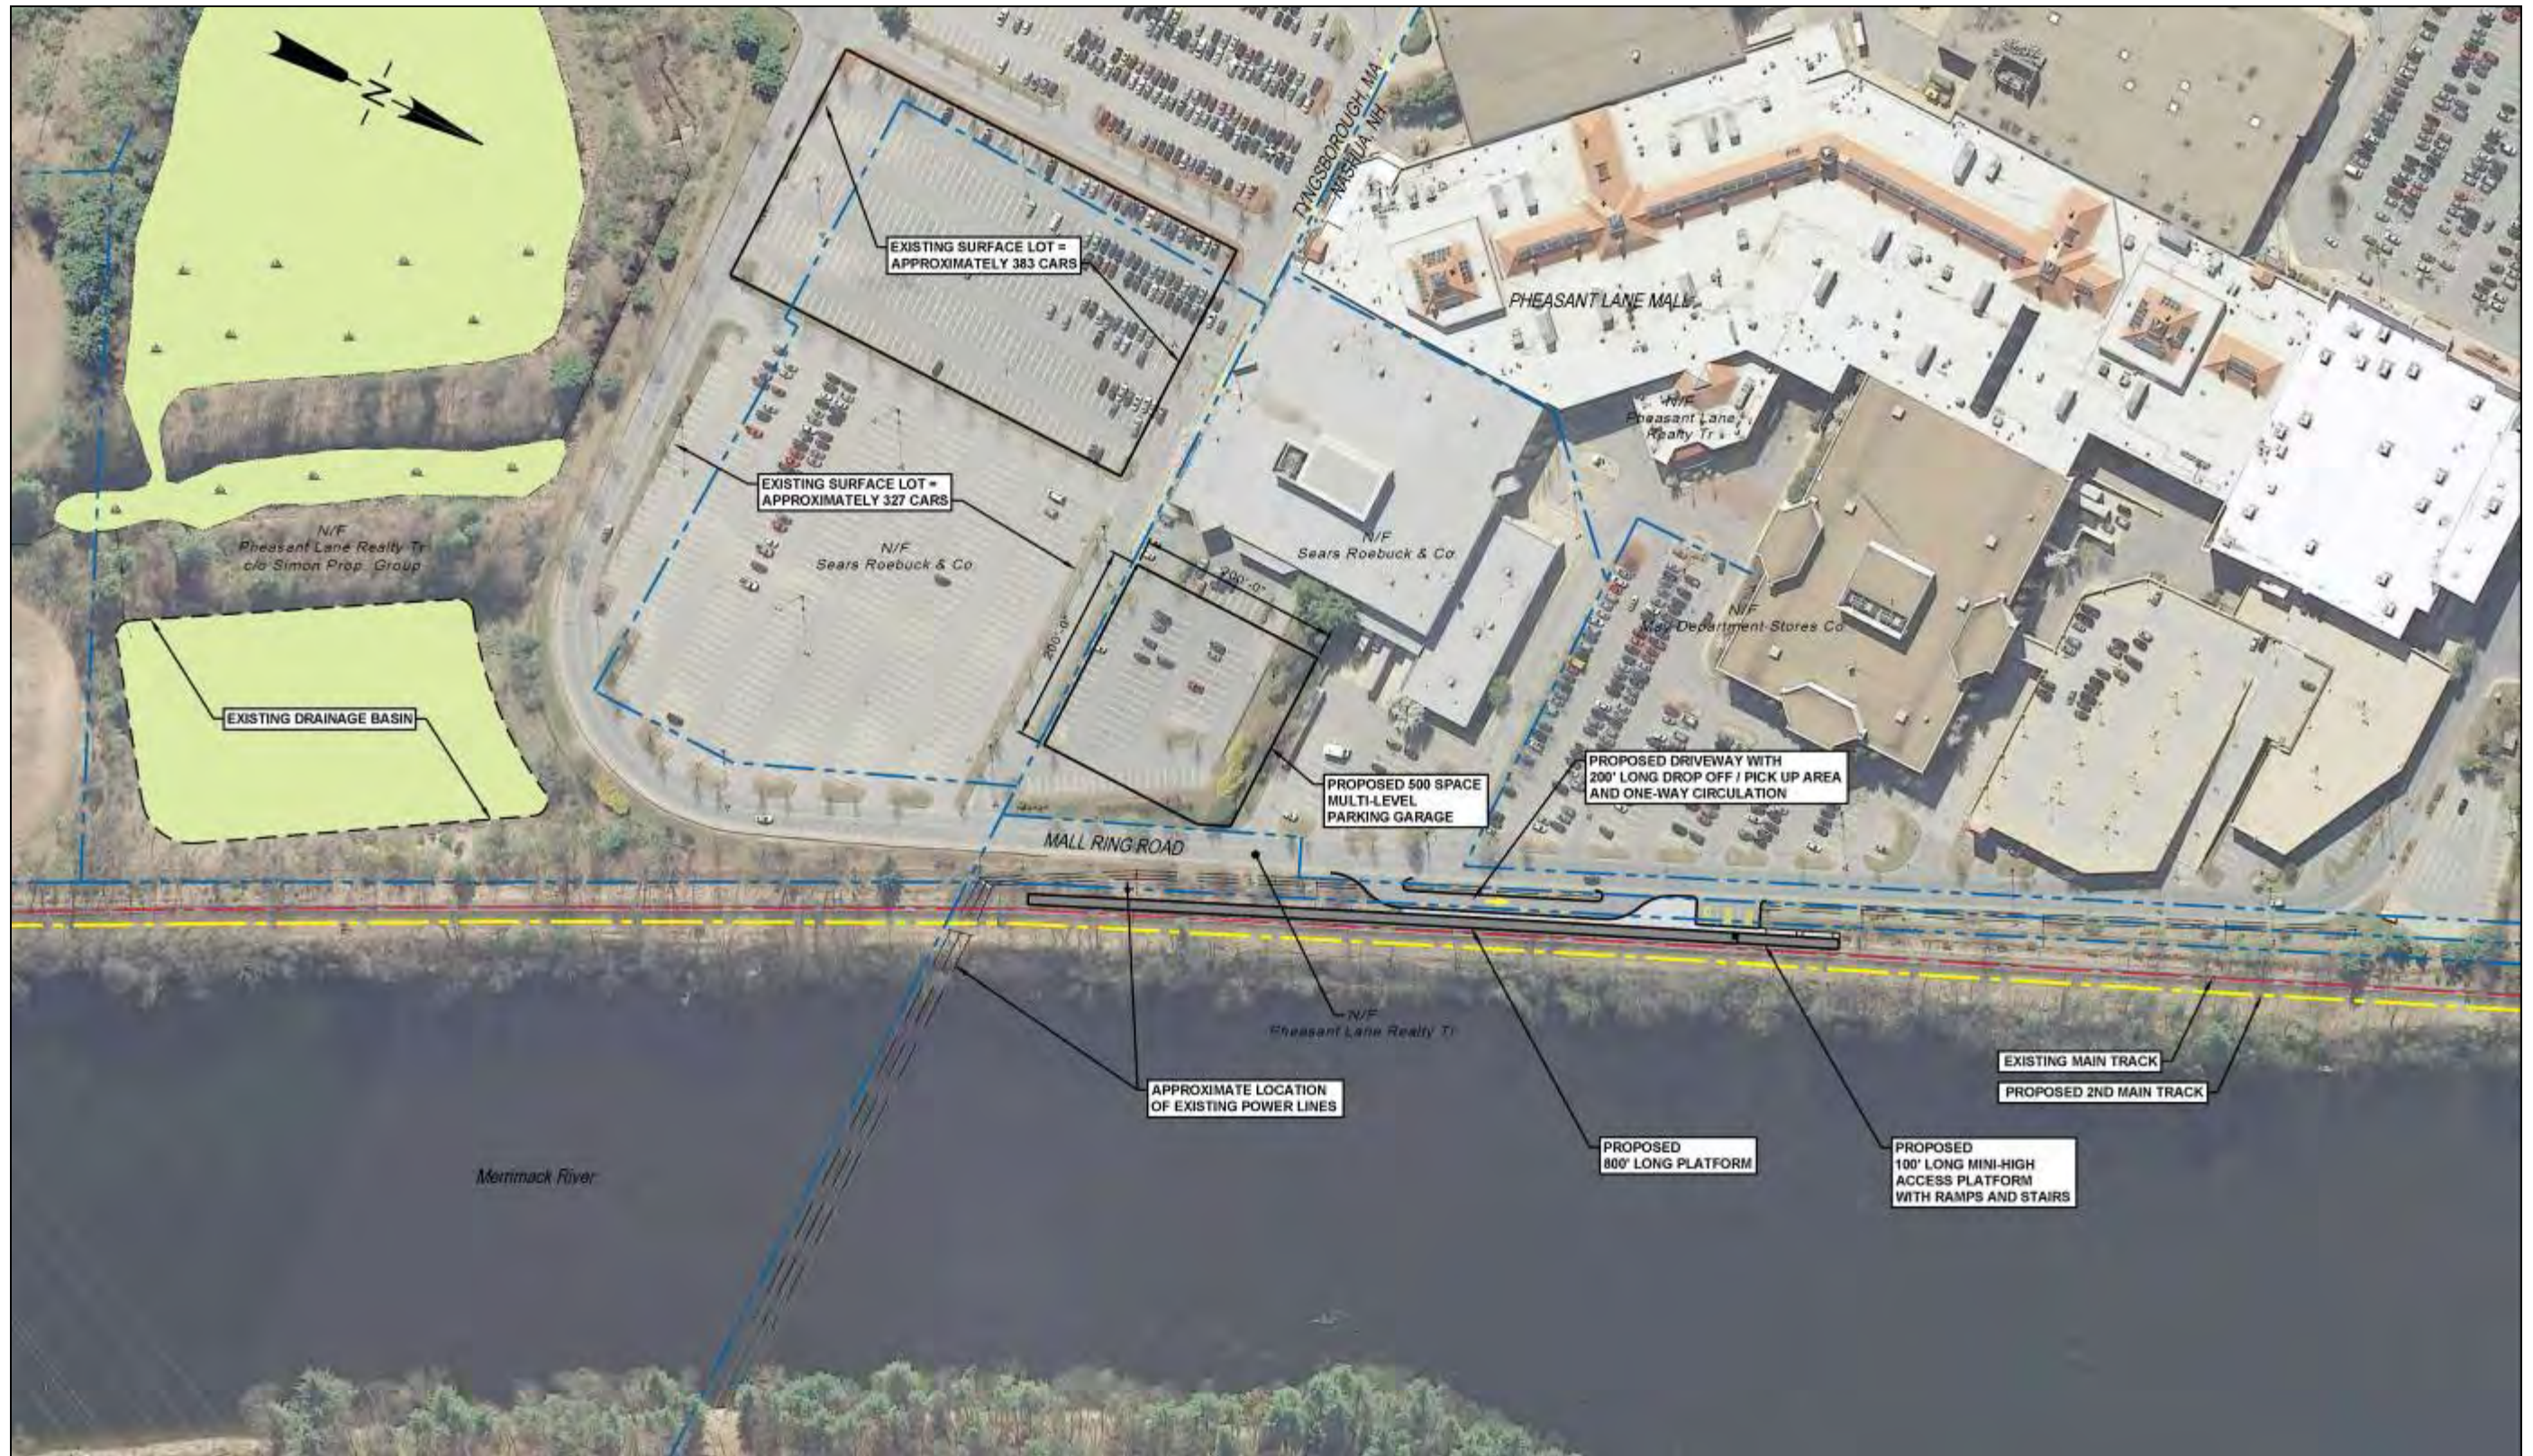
Engineering plan for the Pheasant Lane Mall Station and parking area.
